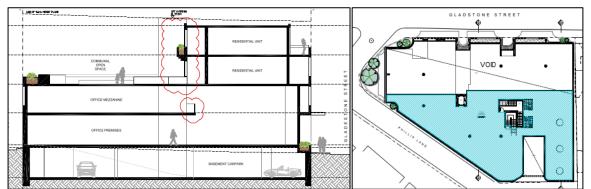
Approved plans – cross section and mezzanine/level 1 (GFA highlighted in blue)
